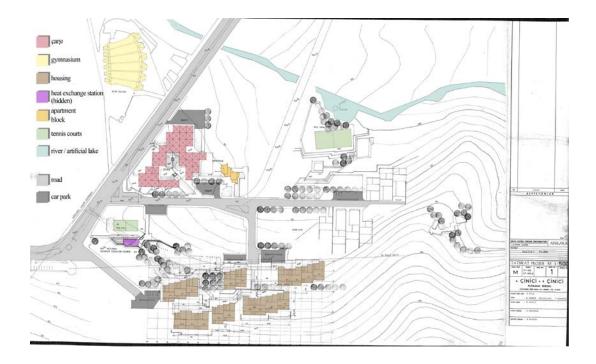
Site plan of the area Source: METU Directorate of Construction & Technical Works, colored by the author
